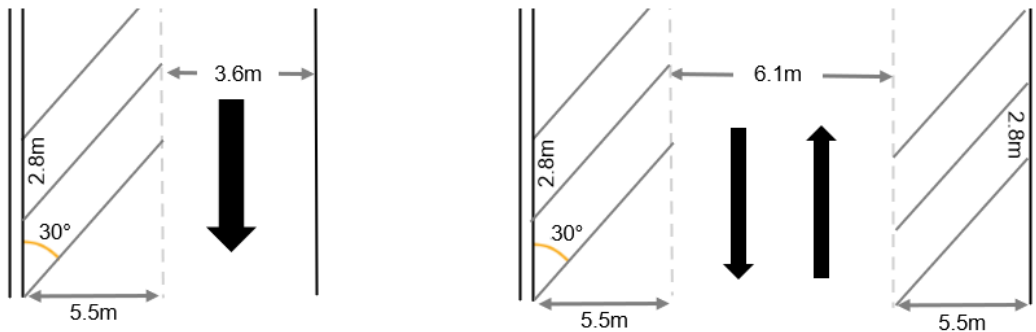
30-degree parking stalls and drive aisle dimension requirements
